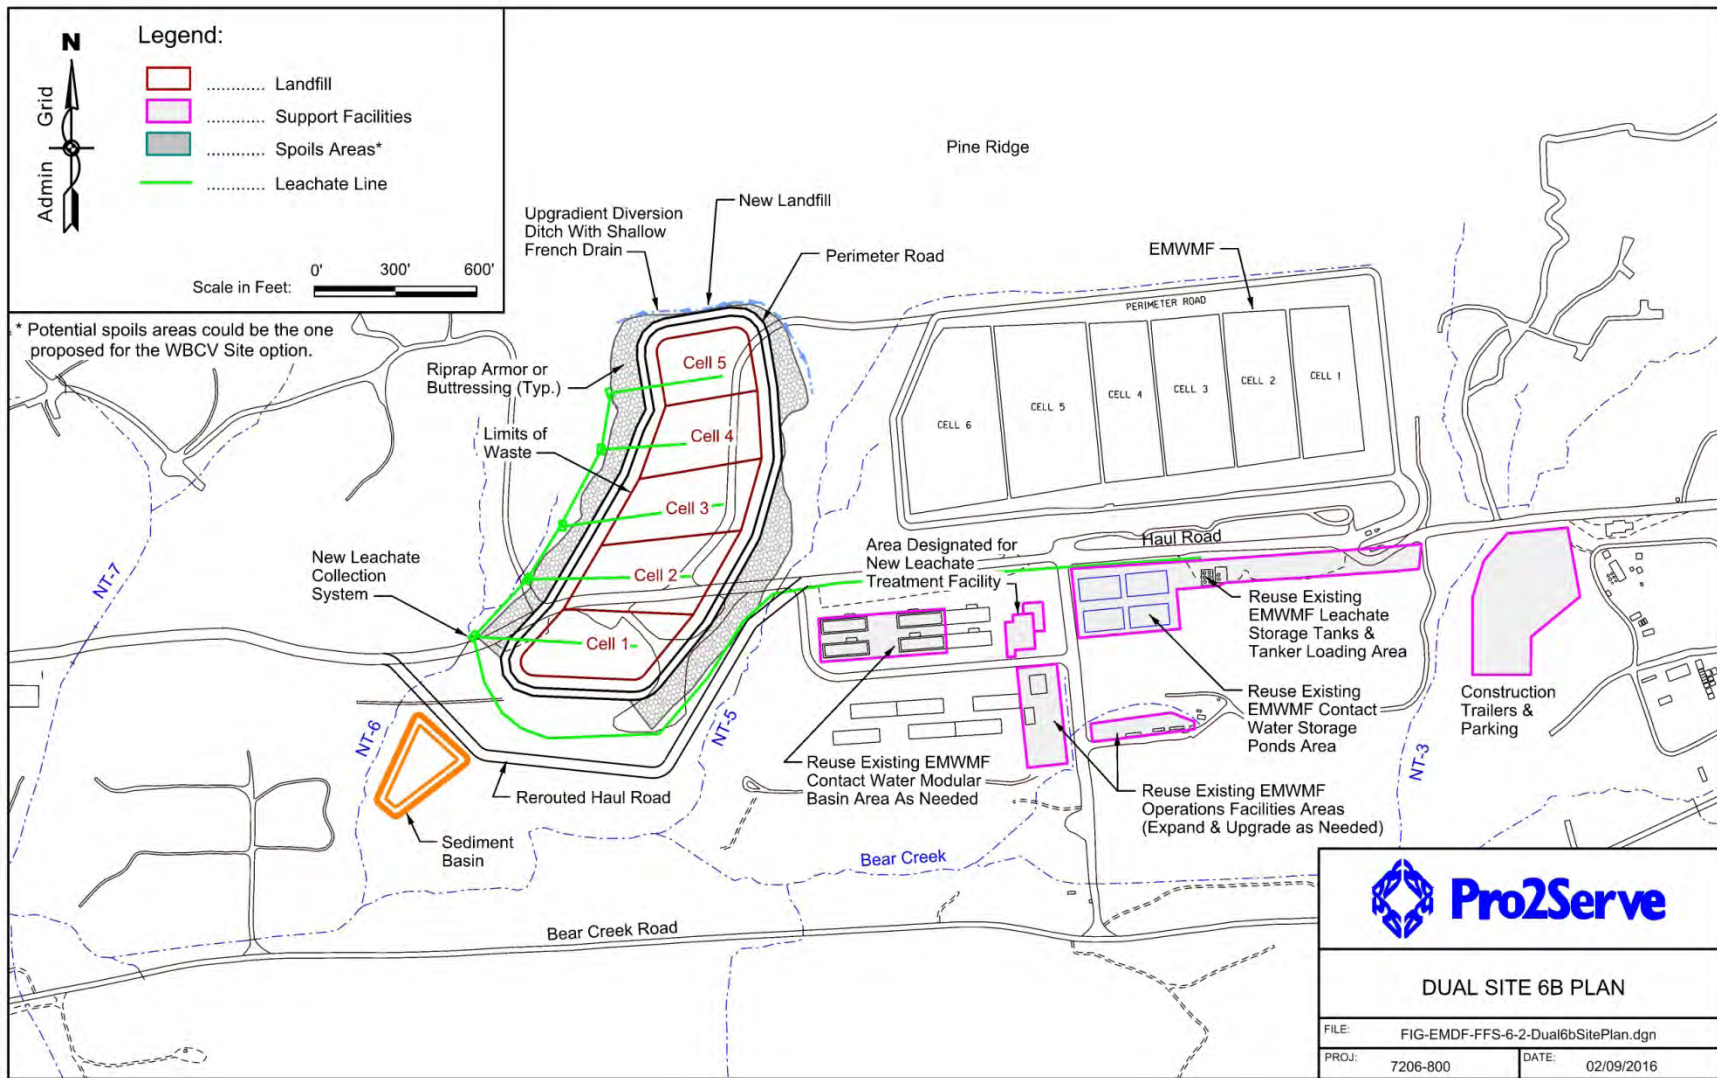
On-site EMDF Conceptual Site Layout Plan at Site 6b of the Dual Site or Hybrid Alternative
